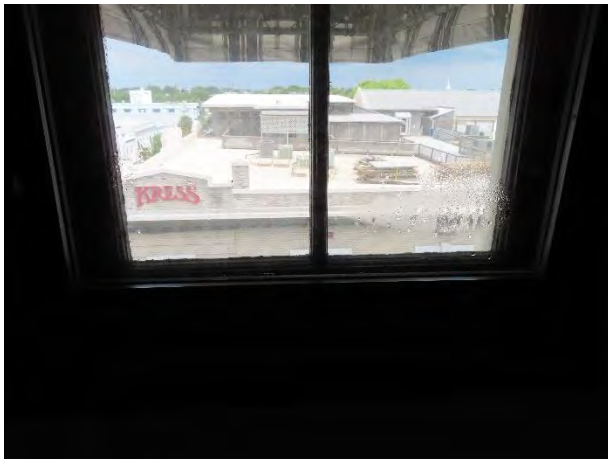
Moisture accumulation between the primary window and the interior glazing.
